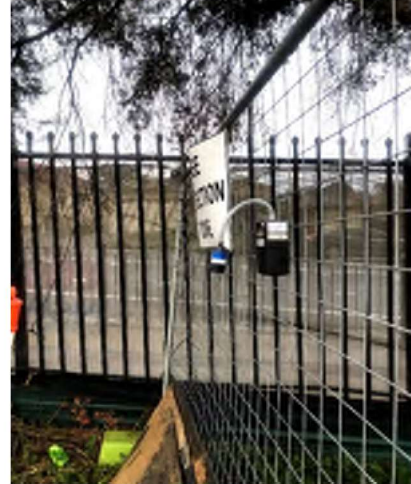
Example of regular air monitoring undertaken at Ramp 9 during excavation work
